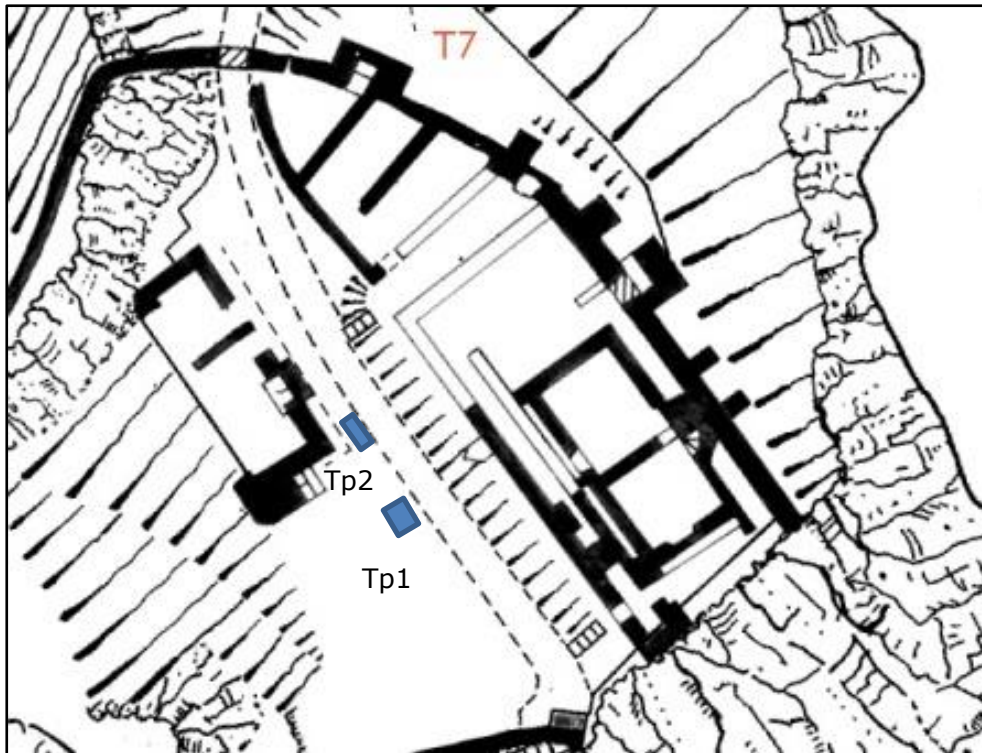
The locations of test pits 1 and 2 (pits not shown to scale).
